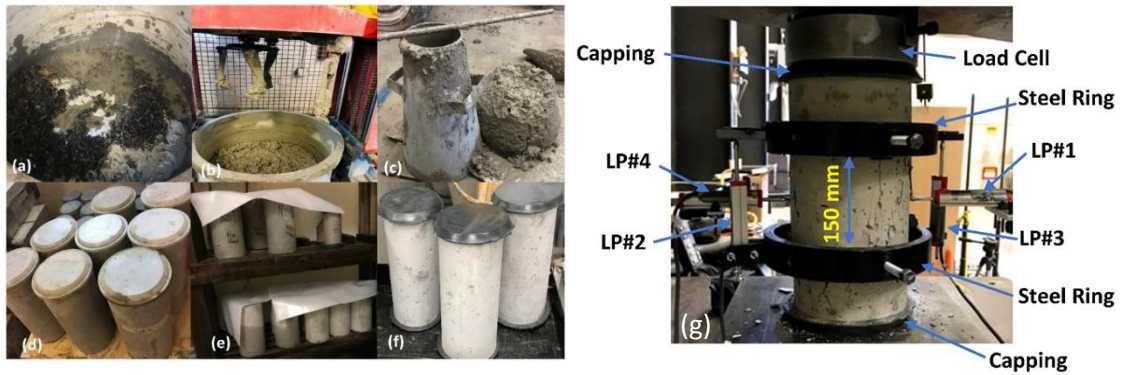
Specimen preparation: (a) concrete material placed in the concrete mixer, (b) mixing concrete material (c) conducting slump test to ensure 100 mm slump is attained, (d) Placing concrete in cylindrical molds for 24 hours, (e) placing specimens in curing room for 28 days, and (f) capping the specimens, (g) test setup and instrumentation.
